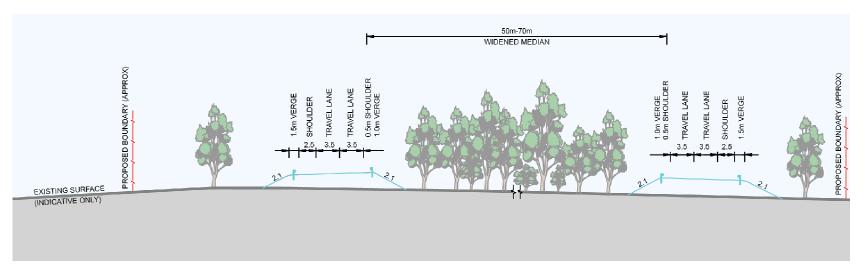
Typical cross-section of a widened median for fauna connectivity (indicative only)
